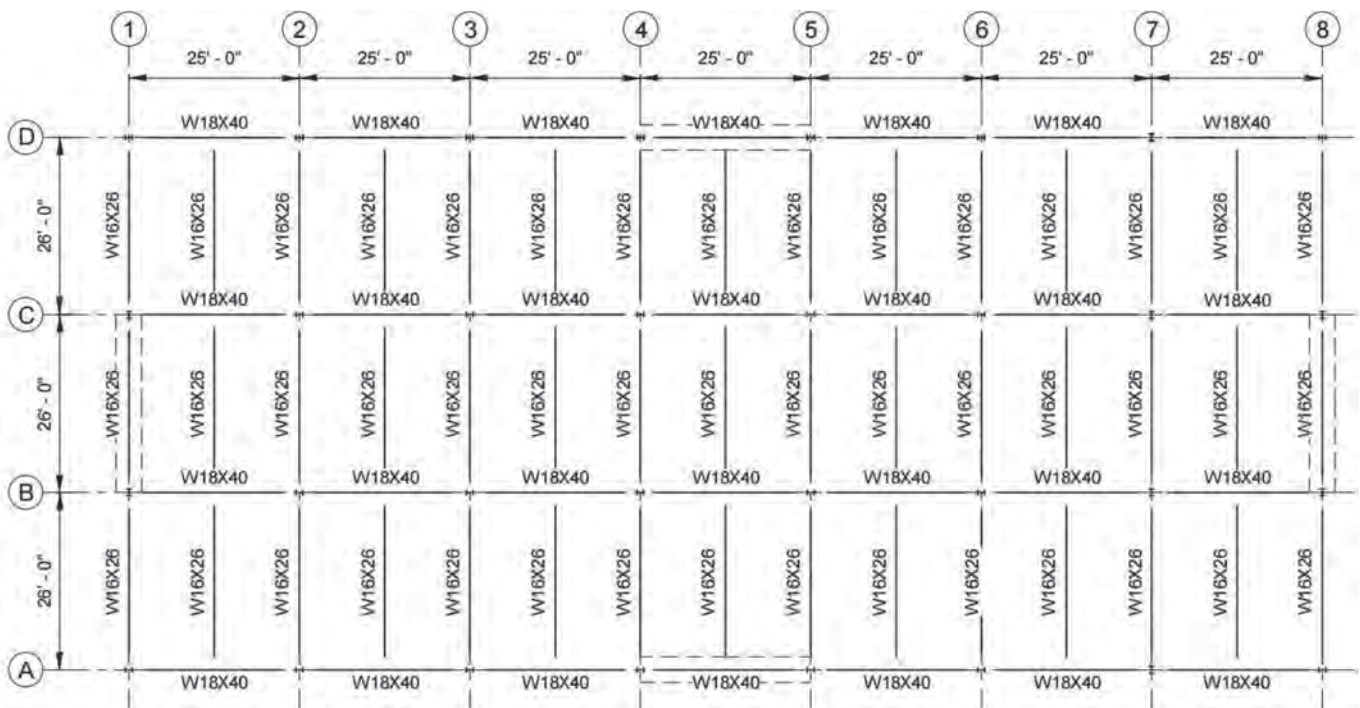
Plan view (level 2) of building B (dotted lines indicate braced frames).
